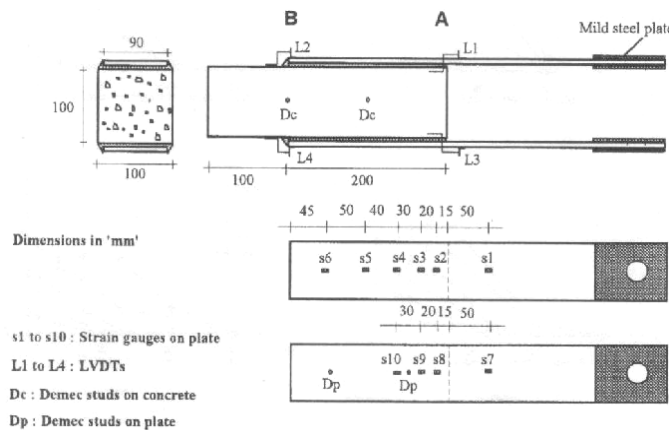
GFRP-Concrete Bonded System Details [21]
